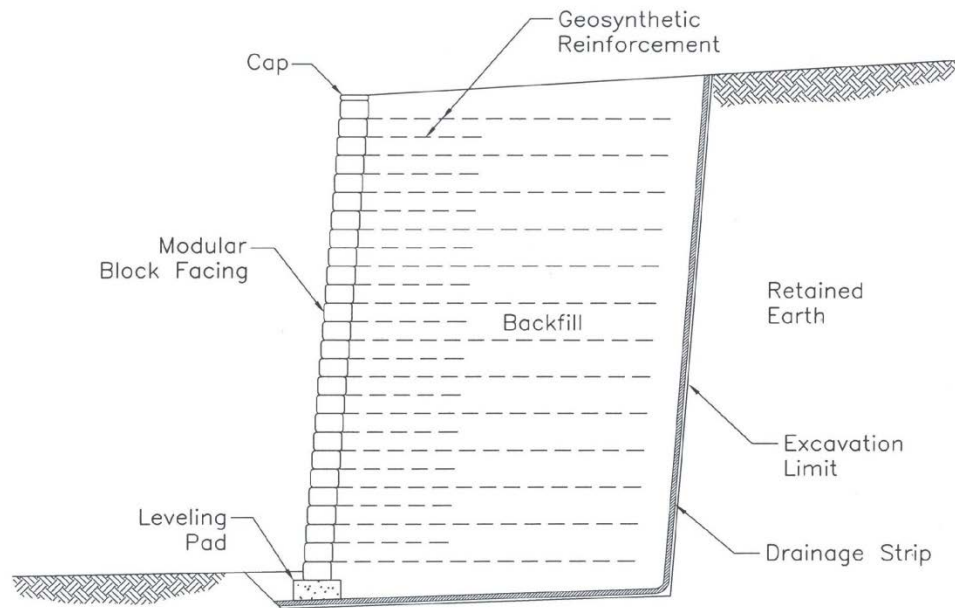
Illustration. Typical cross section of a GRS wall with modular block facing.
